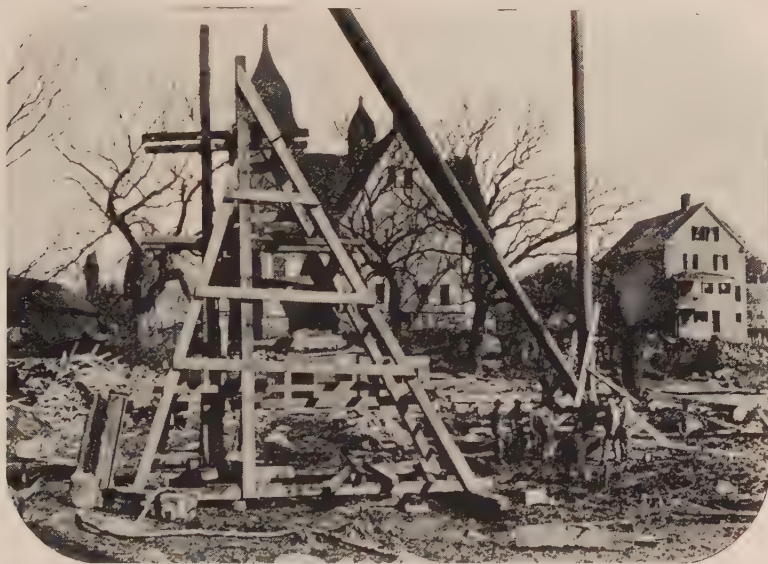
PILE BEING DRIVEN WITH AID OF CONSTRUCTION DERRICK AND TIMBER DRIVING FRAME.
